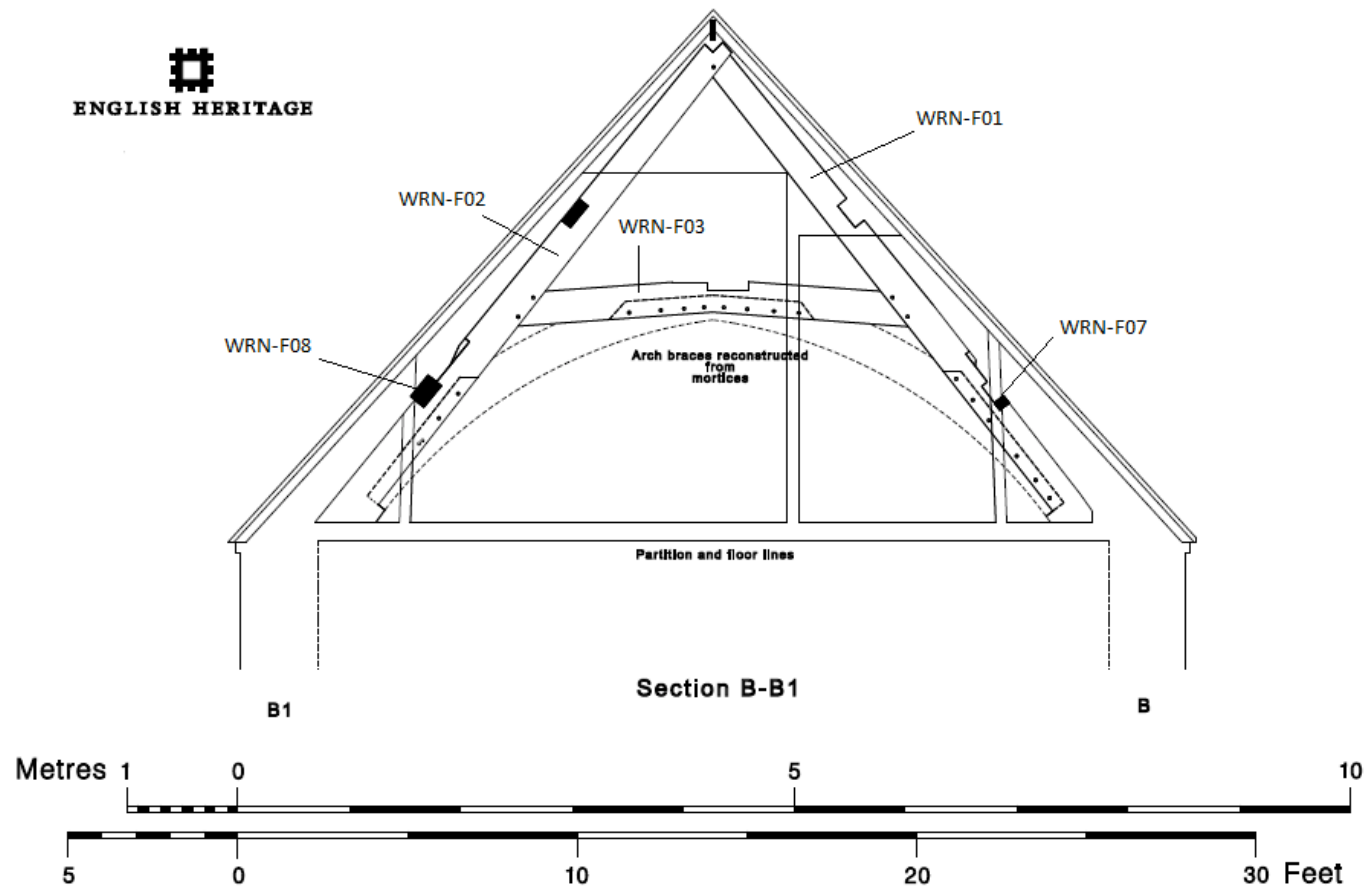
Truss I; showing the location of samples WRN-F01-03, WRN-F07, and WRN-F08 (Barry Jones)
